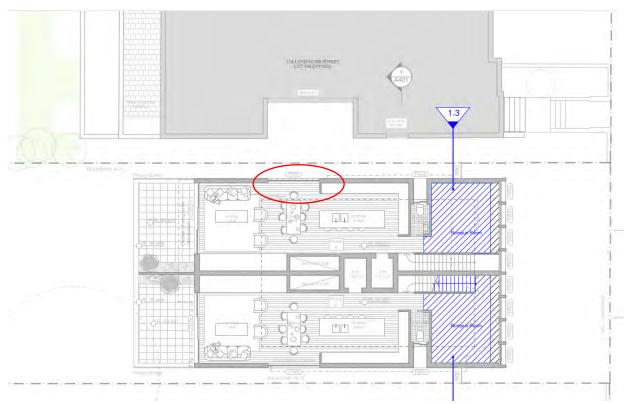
First floor plan of No.15A and B Lord Howe Street. The window circled in red is affected by the proposal.
